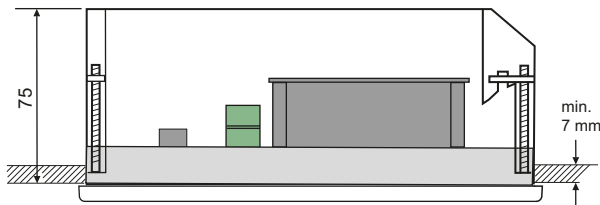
Dimension diagram of MK800-11/MK800-12 with bezel frame BR800 and flush-mounting enclosure UP800. Dimensions in mm. Example: Cavity wall mounting
